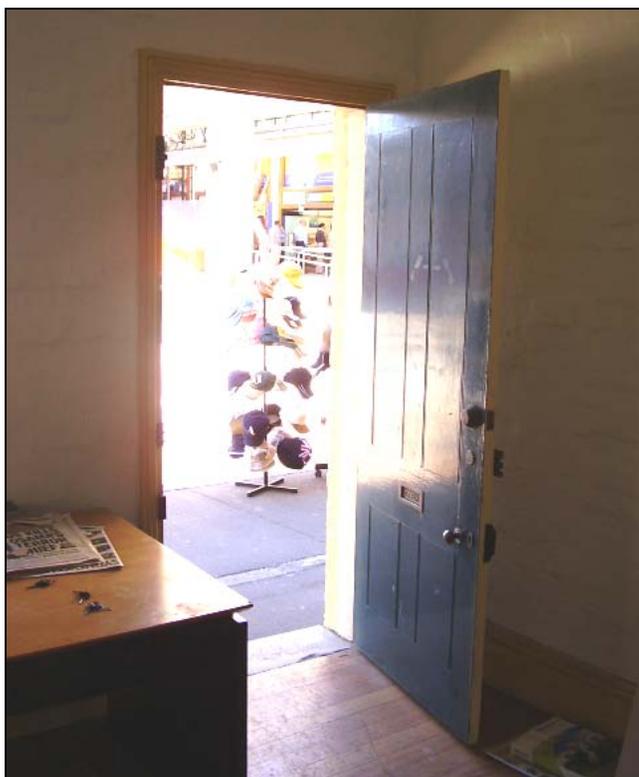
Typical entry door, with timber panelled door. Nos. 27, 25, 21 and 19 do not feature toplights over the entry doors.
